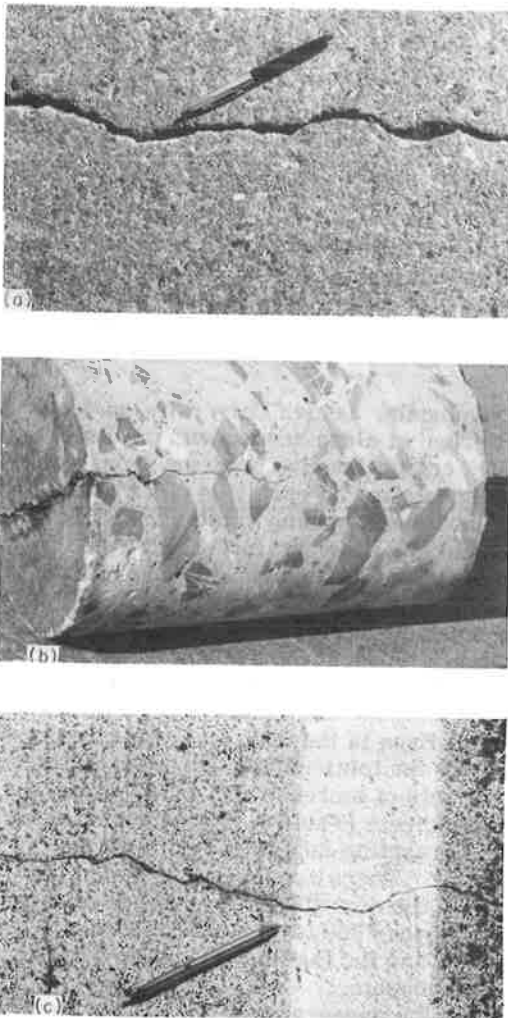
Typical crack on York pavement: (a) spalled appearance at surface, (b) core removed directly over crack, (c) appearance of crack at edge of pavement.
